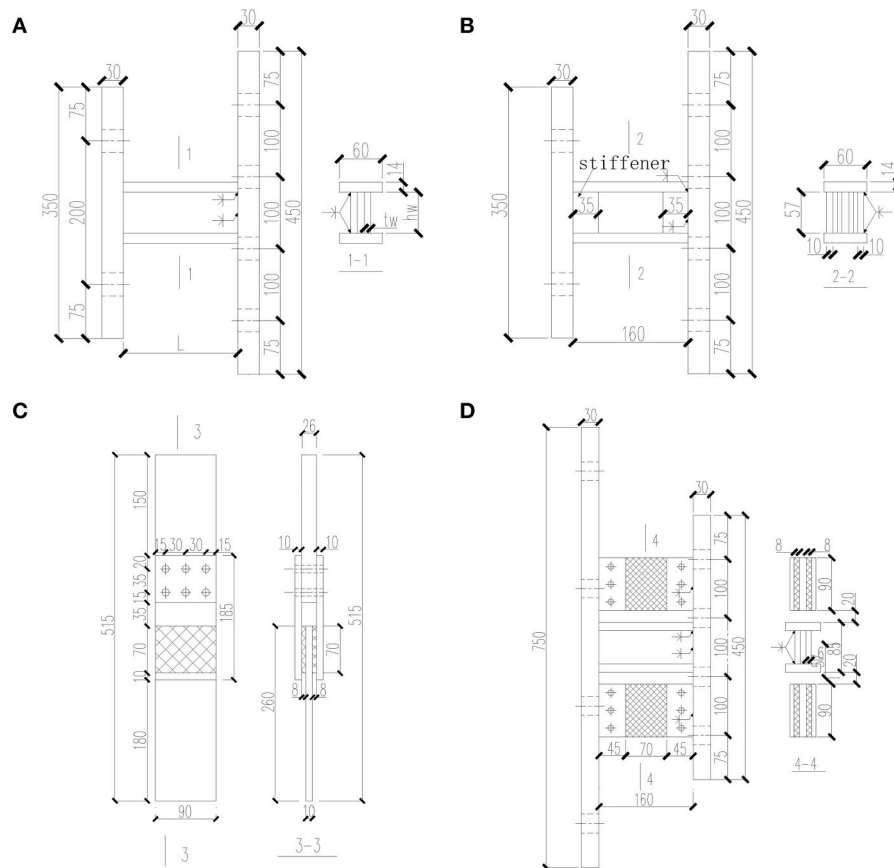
| Test specimens: (A) metallic dampers M1-M7; (B) metallic damper M8; (C) VE damper; (D) combined damper.
